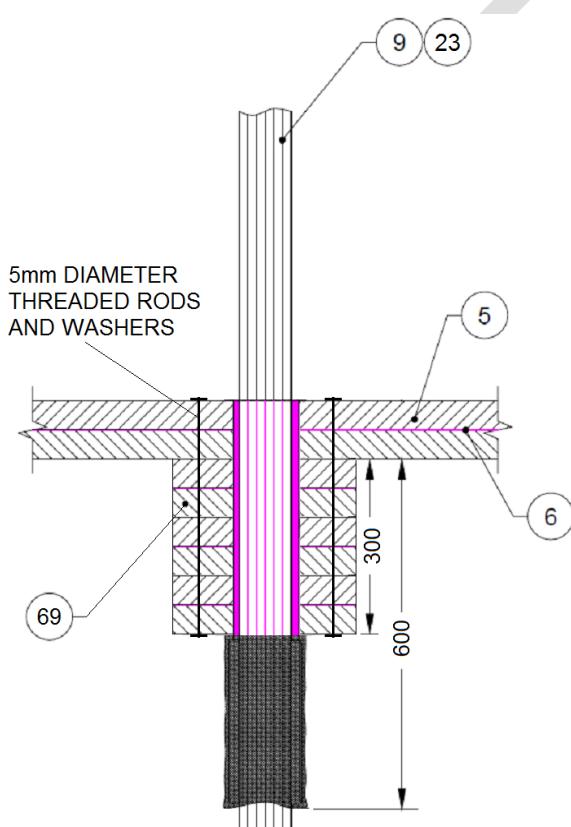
Section View of D1 and D2 Cables with/without Cable Trays in TBA Firefly™ Intubatt not against Wall Construction in Horizontal Substrates - Wrapping each side
